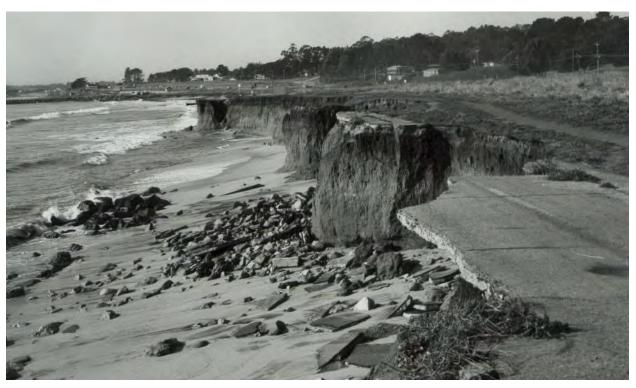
Site Photos; Surfers Beach Sand Restoration
